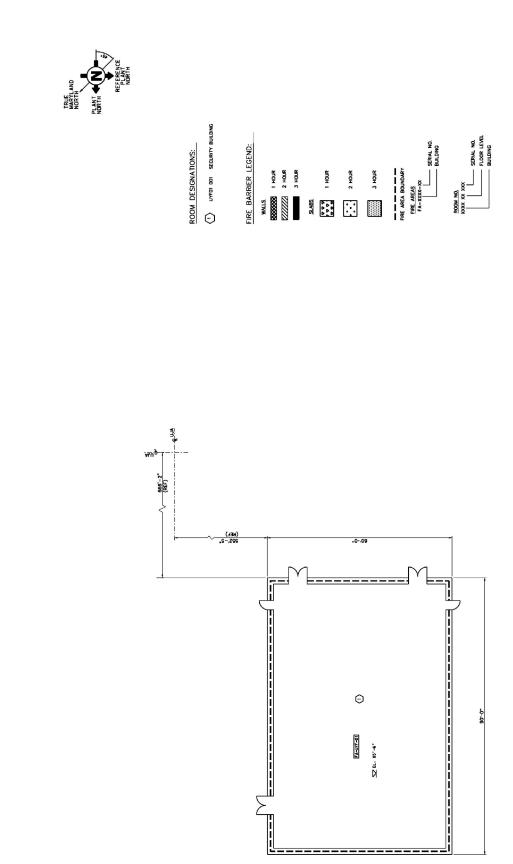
B-17 {Fire Barrier Location, Security Access Facility Plan}
